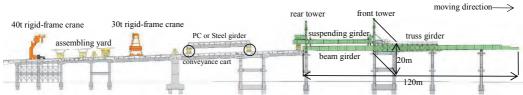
Schematic diagram of PC and Steel girder and movable erection girder
